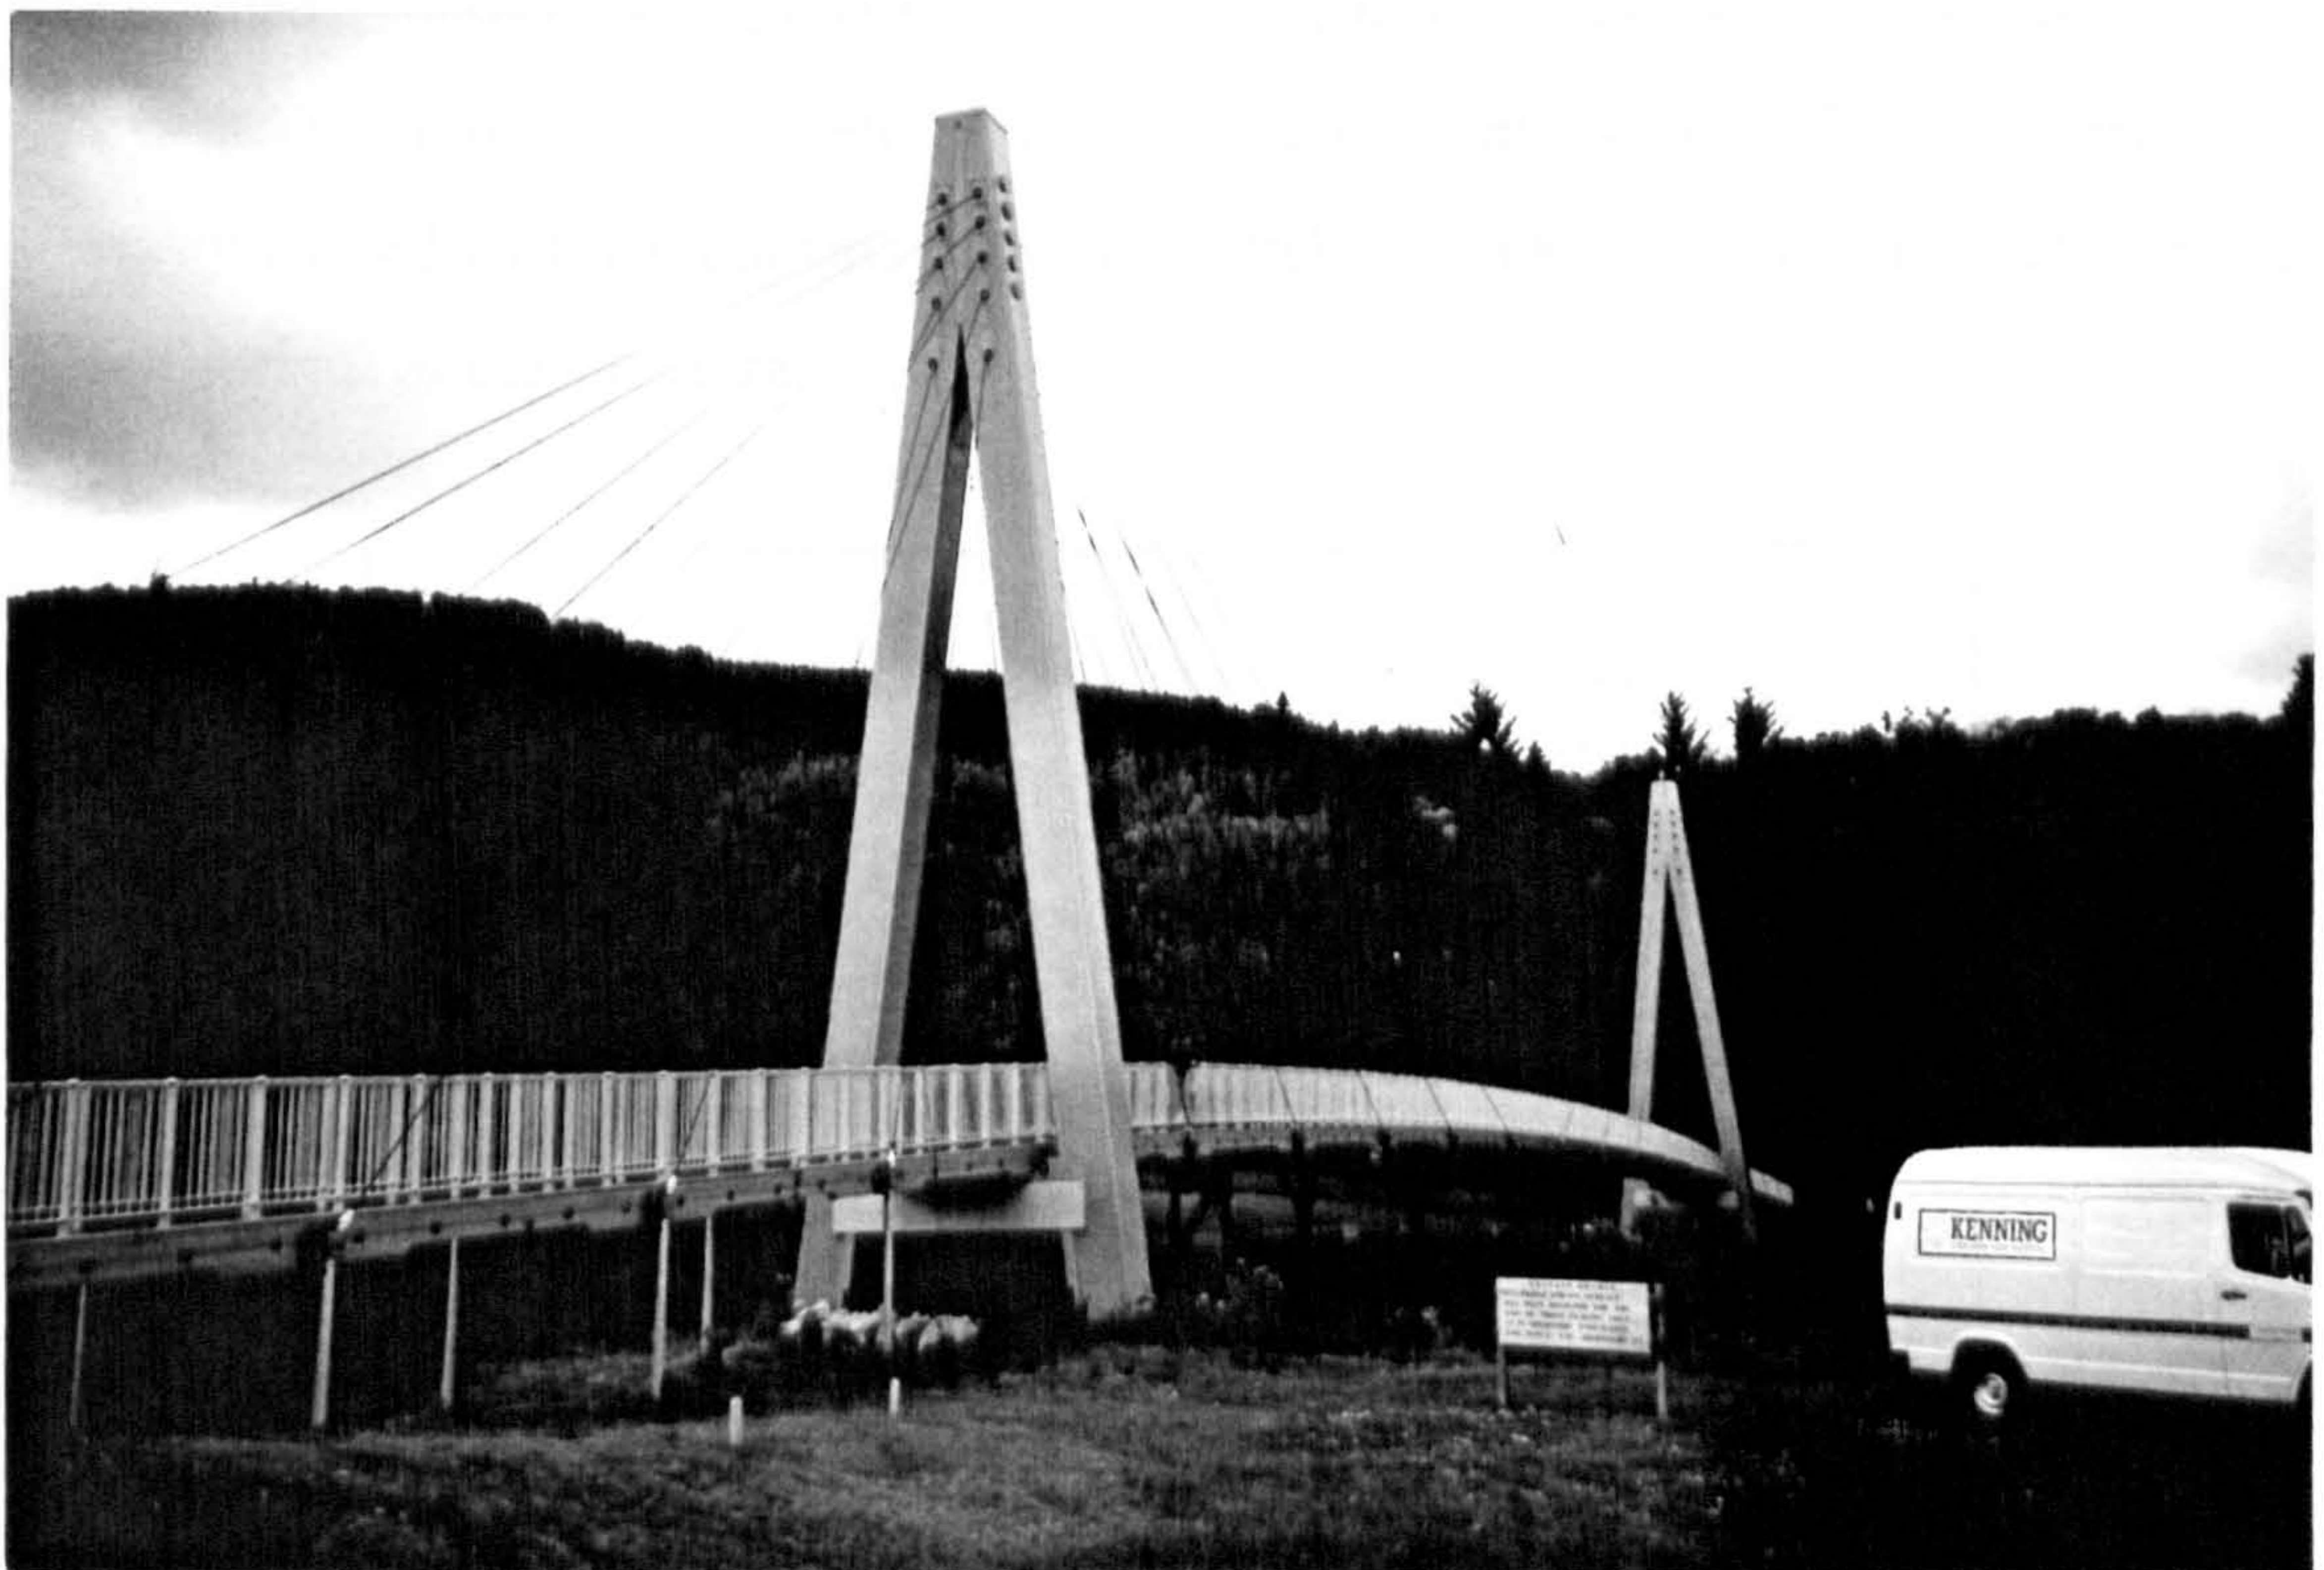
Aberfeldy GRP cable-stayed footbridge
